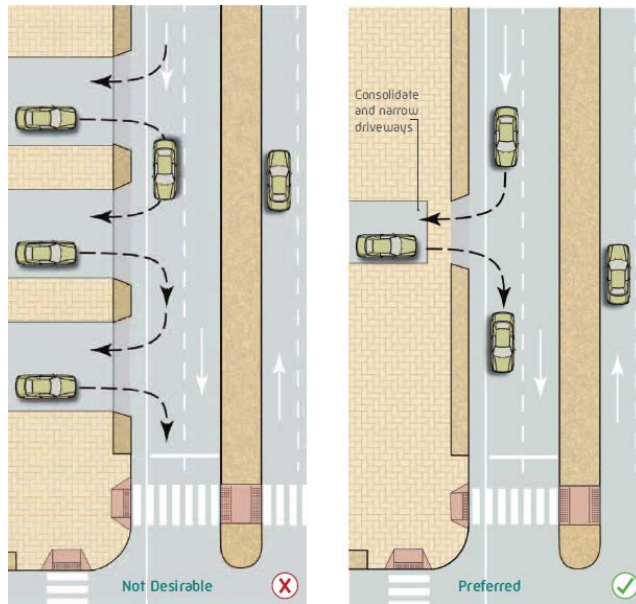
Continuous Sidewalk Design Establishes Pedestrian Space over Driveway
